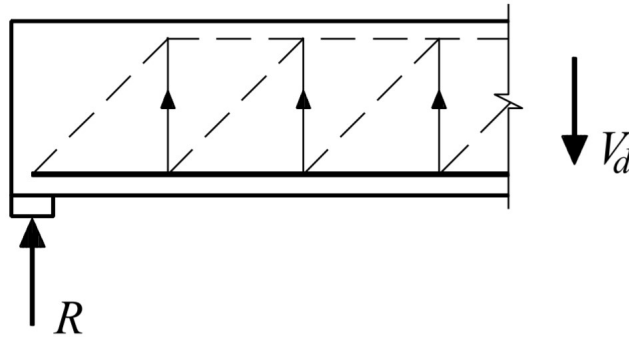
Truss model where the shear force is carried by inclined compression struts and vertical stirrups (Engström, 2015)
